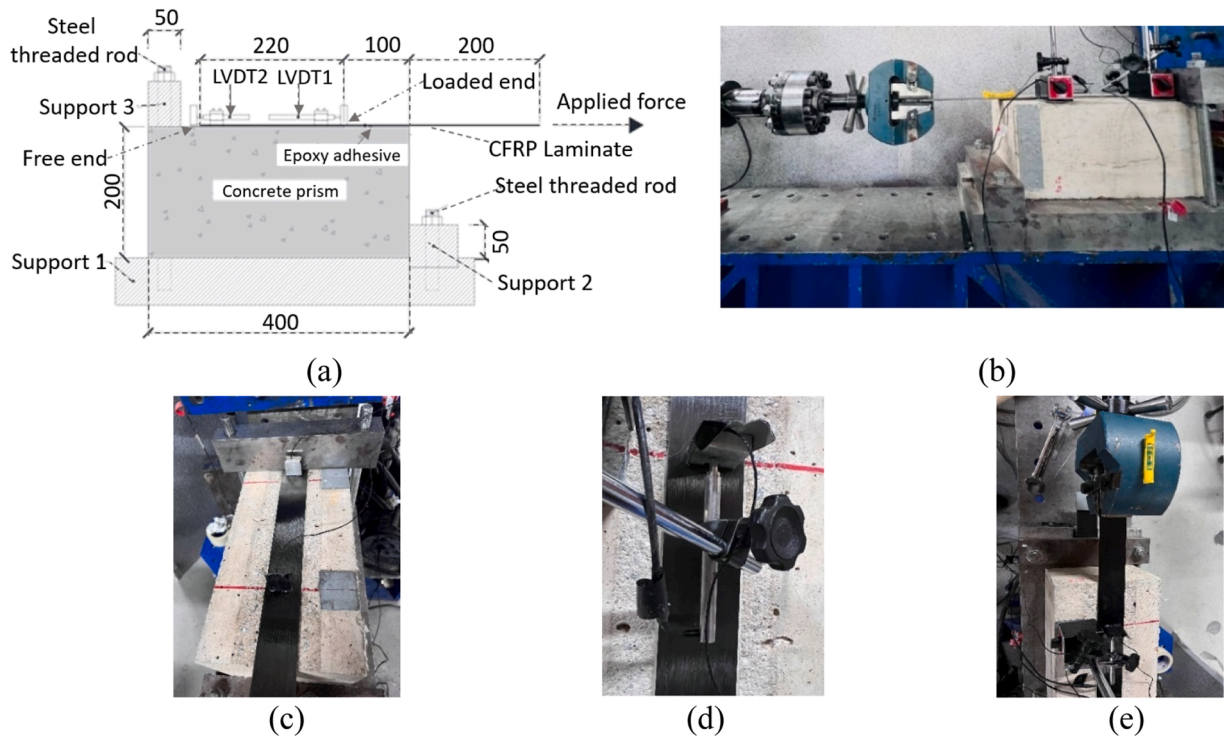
Single-lap shear tests: (a) specimen's geometry and test set-up, (b) photograph of the full test configuration, (c) mounting LVDTs supports, (d) mounting LVDTs and (e) verification of the clamp and CFRP alignment. Note: all units in [mm].
